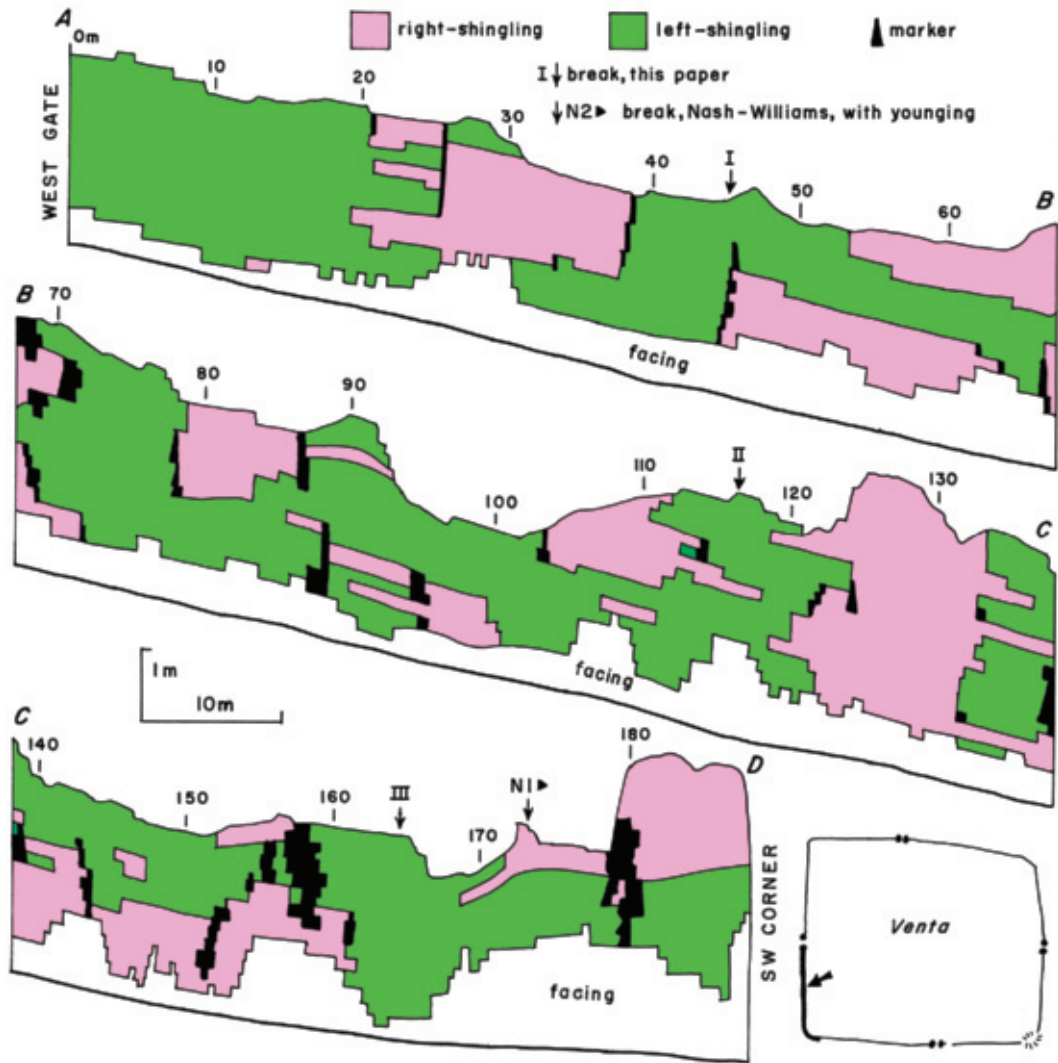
South-west Wall at Caerwent, from the West Gate to the south-west corner.
